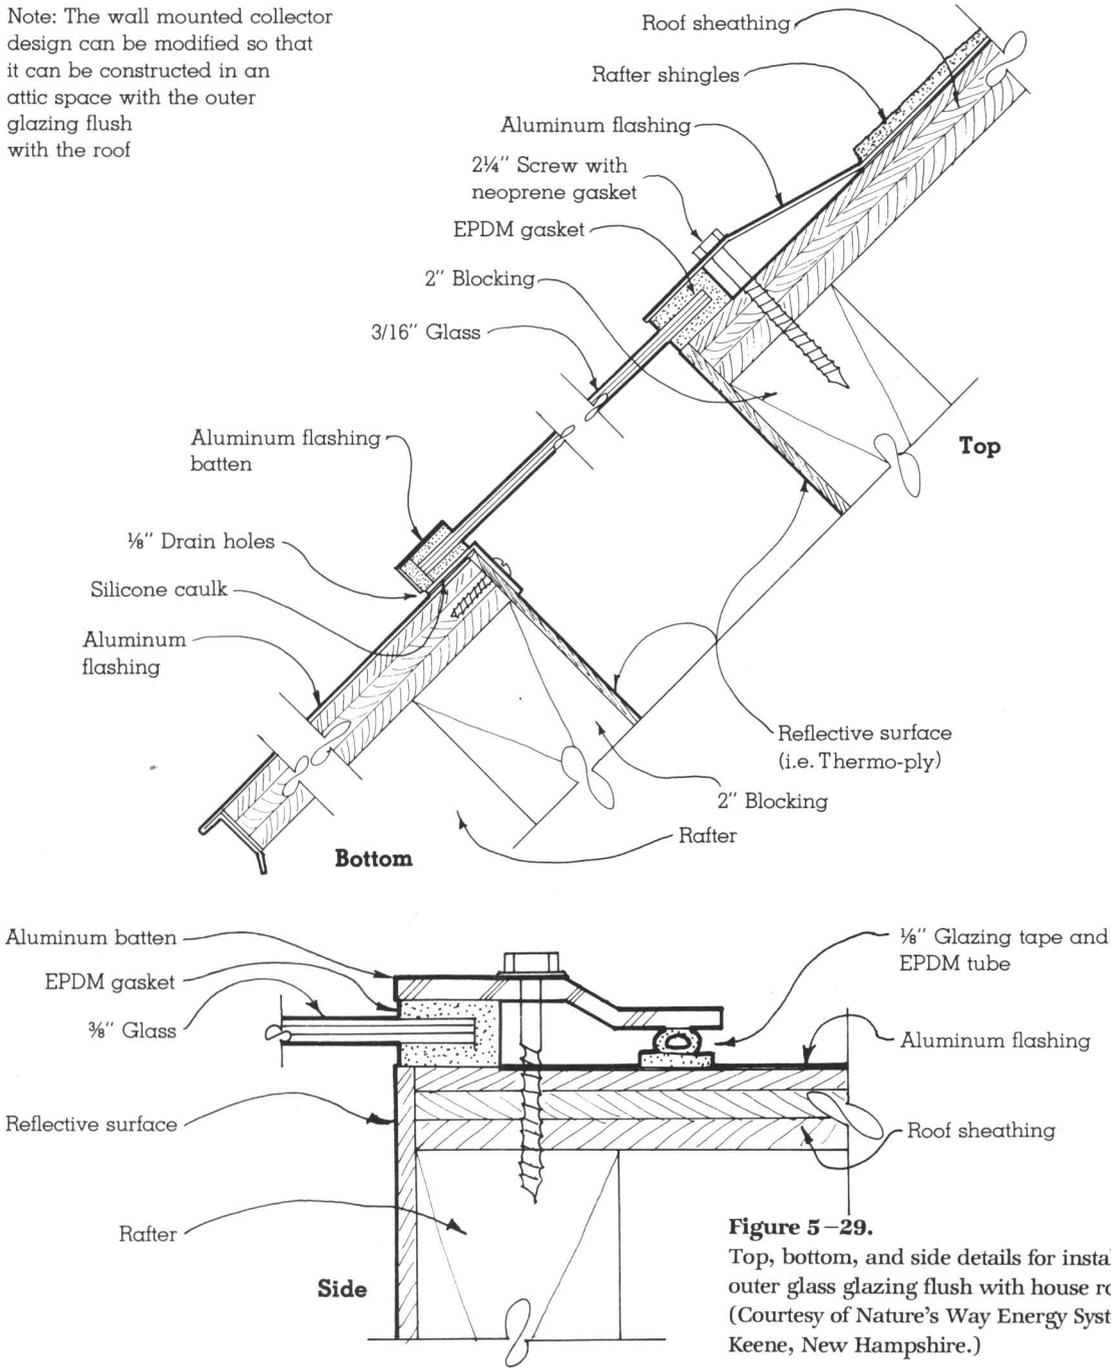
Top, bottom, and side details for installing outer glass glazing flush with house roof. (Courtesy of Nature's Way Energy Systems, Keene, New Hampshire.)
